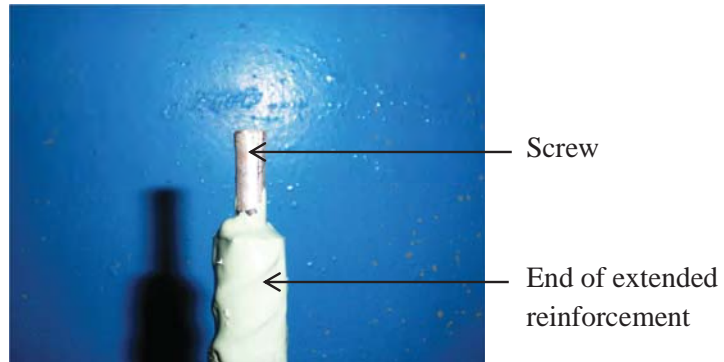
Stainless steel screw connected to bottom reinforcement
